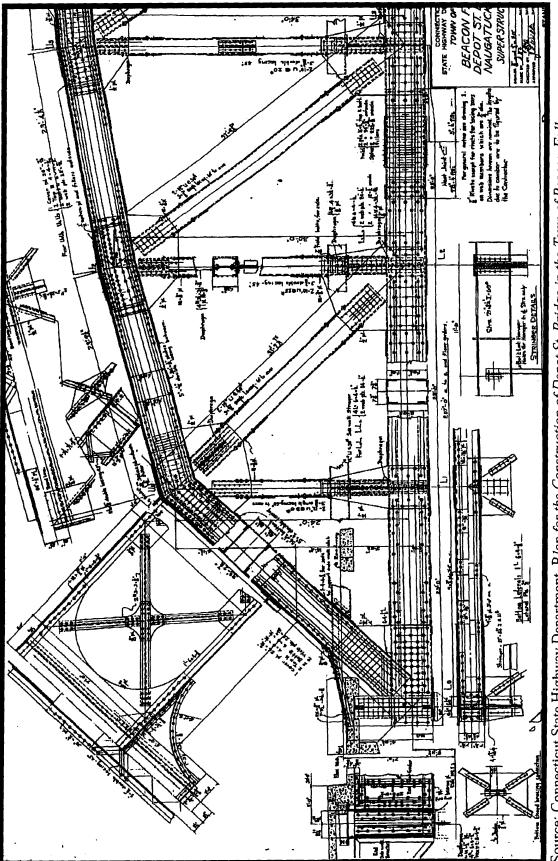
PLAN OF SUPERSTRUCTURE (SHEET A)
